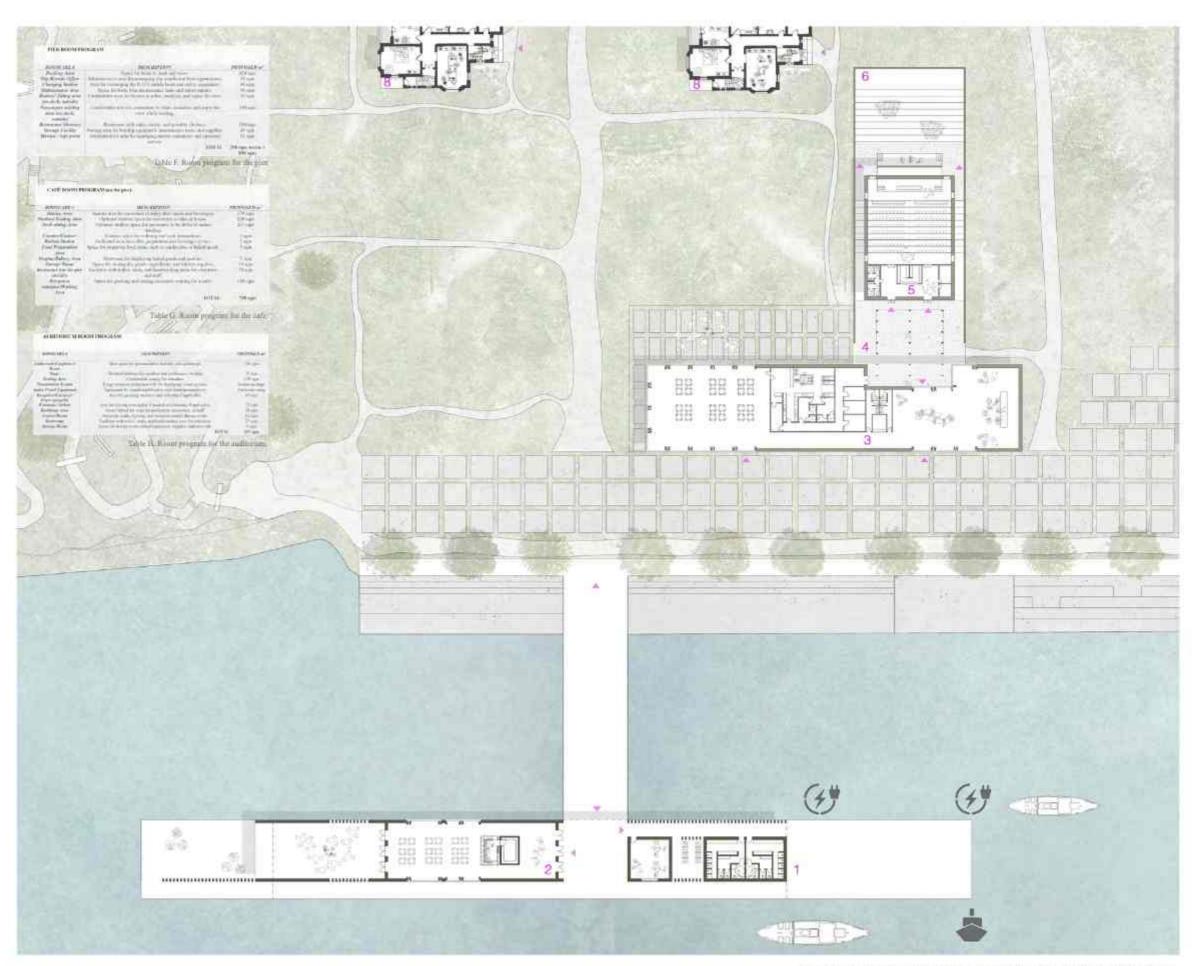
Diagram illustrating the zoom in on the floor plan for the pier and auditorium.
